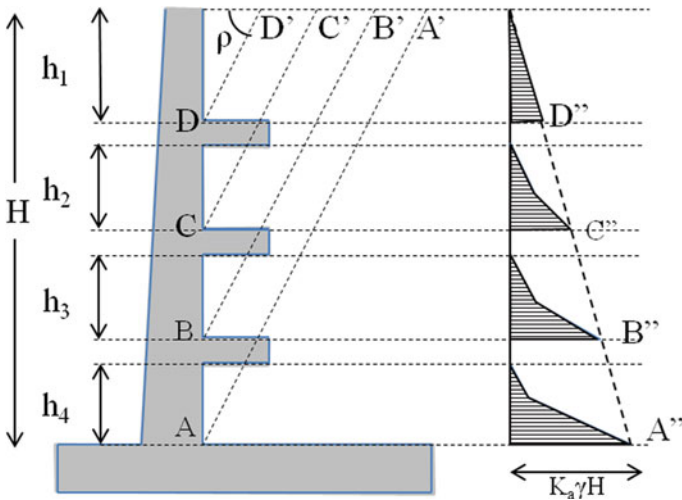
Lateral earth pressure for multi-shelved retaining wall
